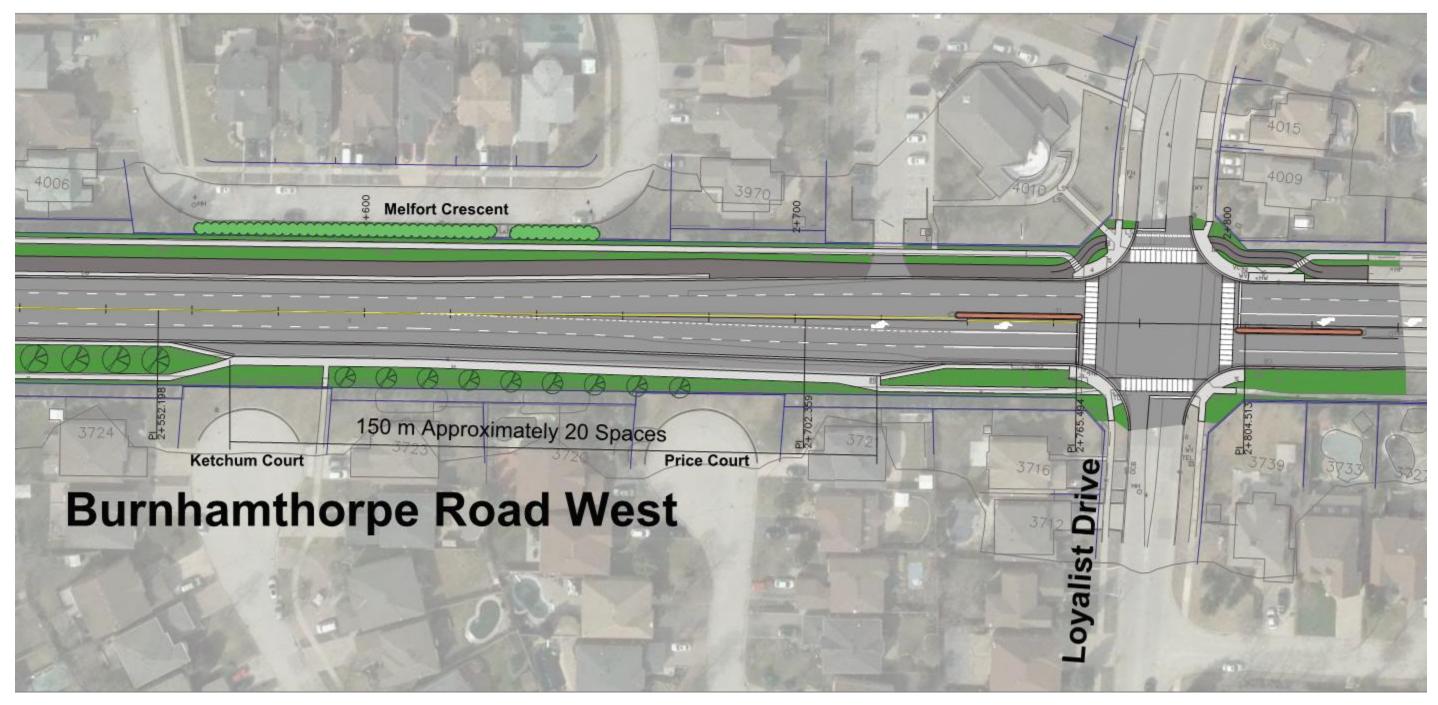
Alternative Design Concept #3 - Widen Burnhamthorpe Road West to 4 Lanes with In-Boulevard Parking on the South Side
